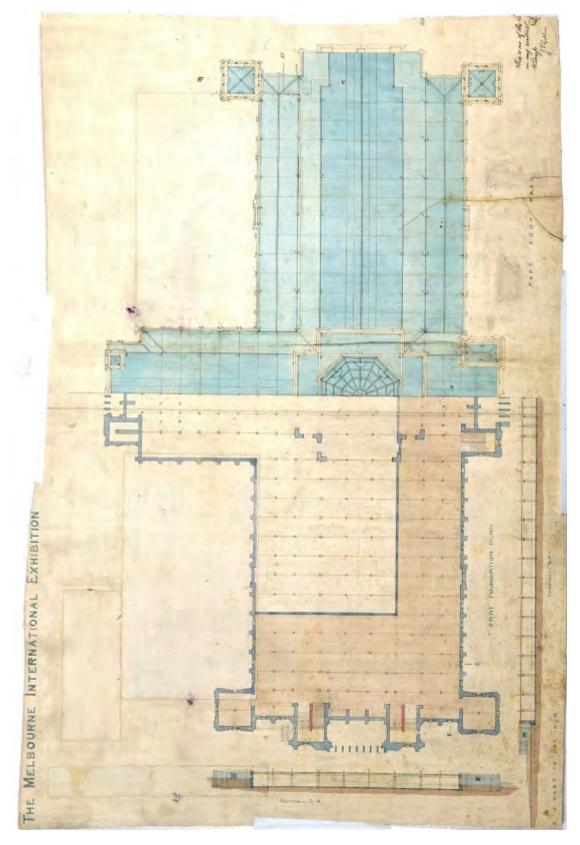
The Melbourne International Exhibition, part foundation plan, part roof plan, n.d. Source: Bates Smart & McCutcheon archives
